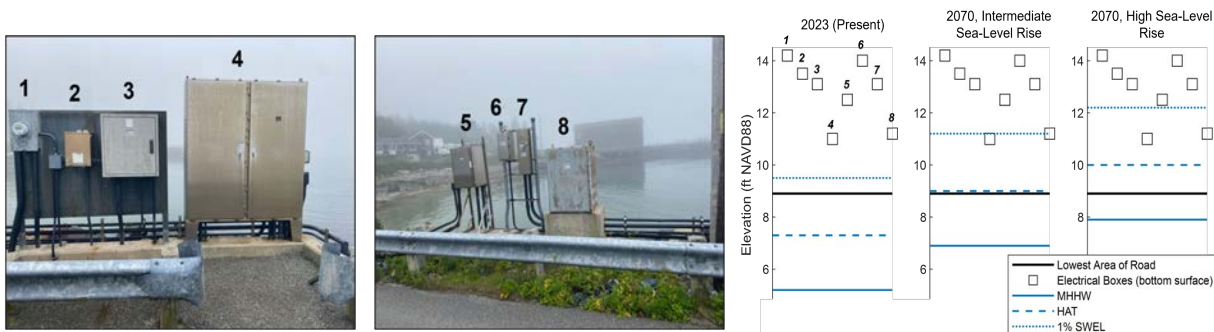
Elevations of boxes containing electrical equipment on the MaineDOT Bass Harbor Ferry Terminal Bridge, relative to present and 2070 high water elevations.
